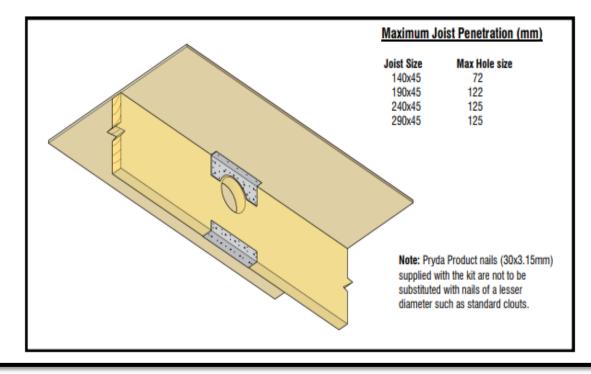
Sample of 'Pryda Stren-Joist' joist stiffener from 'Pryda' specifications
